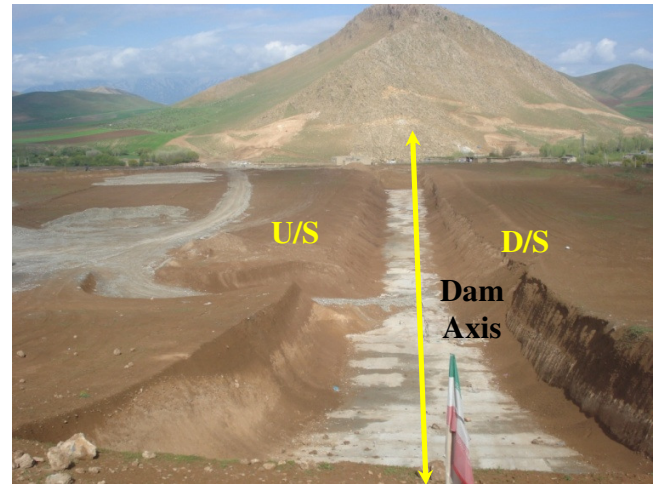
A view from Gerdebin Dam Axis and preparation for grouting execution in excavated trench under clay core.
